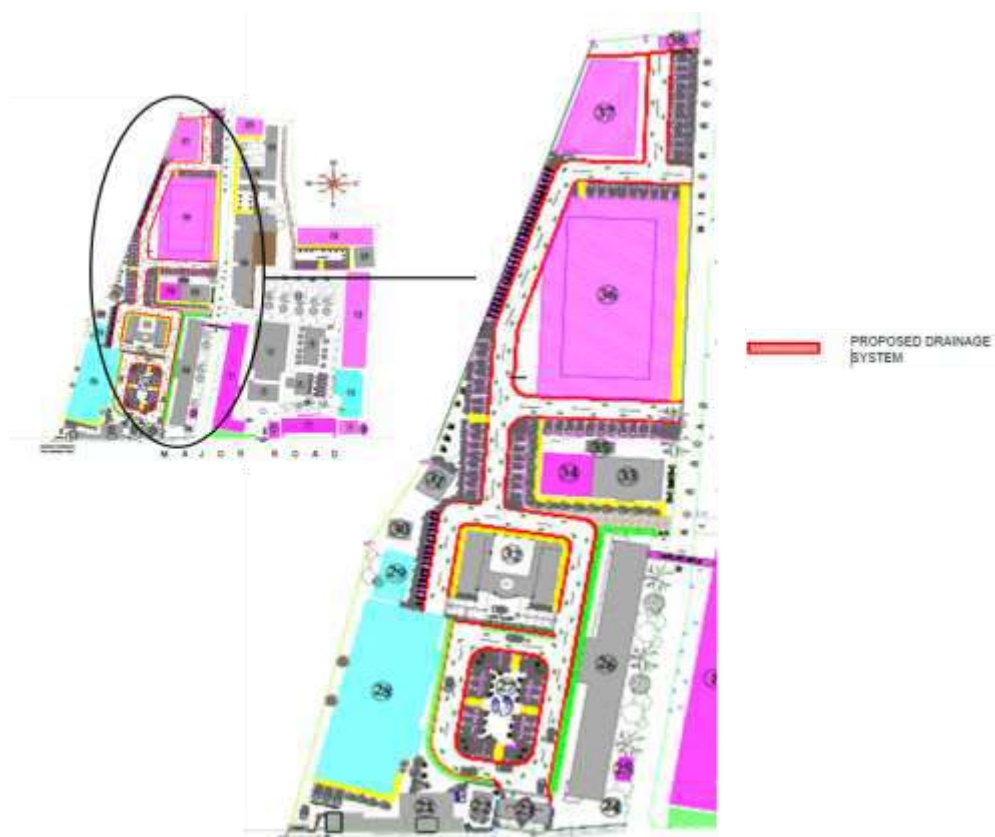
Proposed Drainage Plan for PESS and Ground 2
